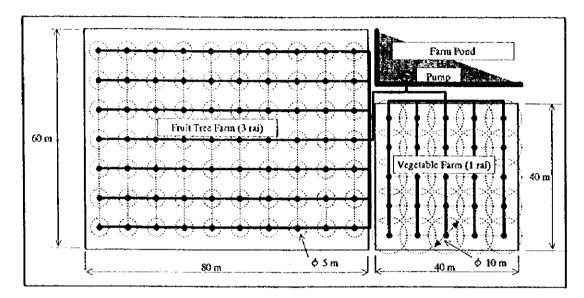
Typical Alignment of Sprinkler System for Large Farm Pond
